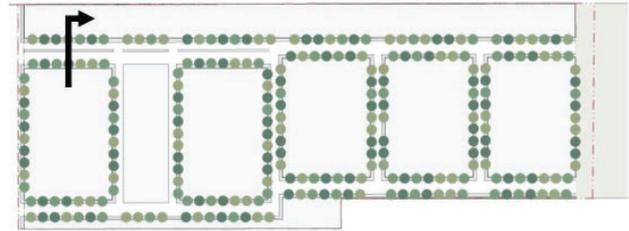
Northern East-West Street - 108-foot Right of Way
